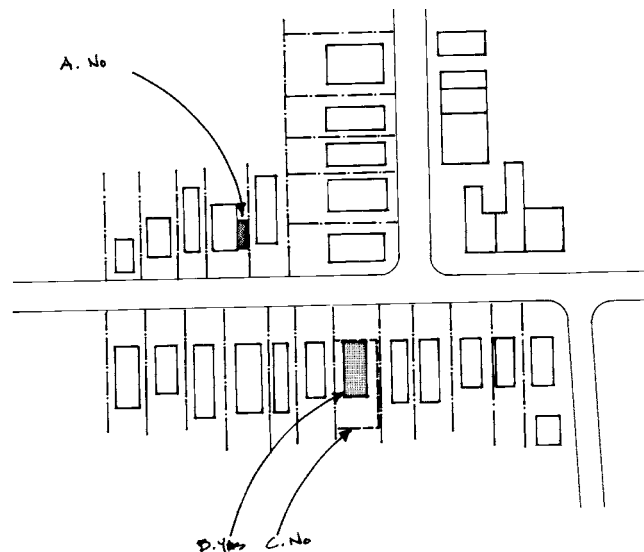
A new building or addition in a neighborhood of regularly spaced houses should follow the existing pattern. Addition “A” encroaches on its side yard, interrupting the spacing between houses. New building “B” conforms to its immediate neighborhood. Building “C” is built the full width of its lot, disrupting the rhythm of spaces and buildings.
